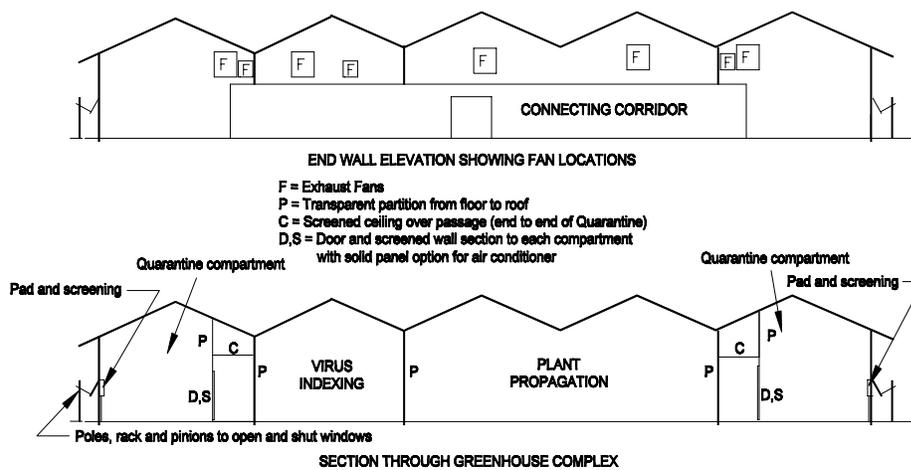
End wall elevation and section elevation of quarantine greenhouse complex.
